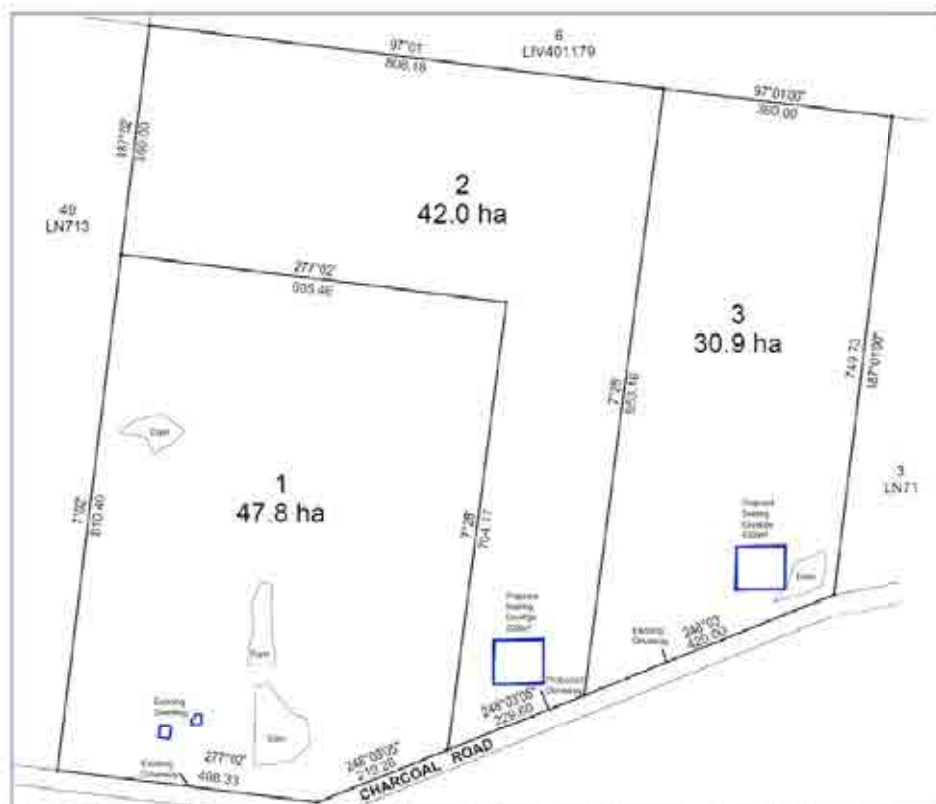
The proposed location of building envelopes and the existing dwelling on Lot 53 on LN599. Modified from original drawing to show relevant areas.
